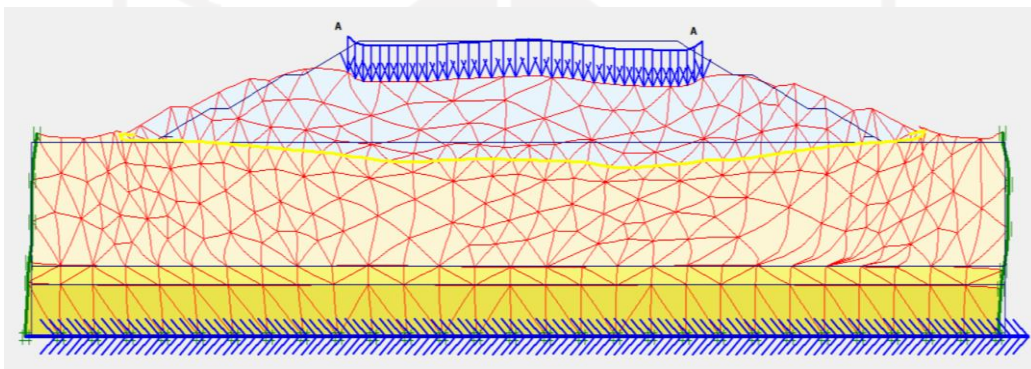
Deformed Mesh of Embankment 2 Trap with Geotextile Reinforcement Due to Traffic and Earthquake Load
